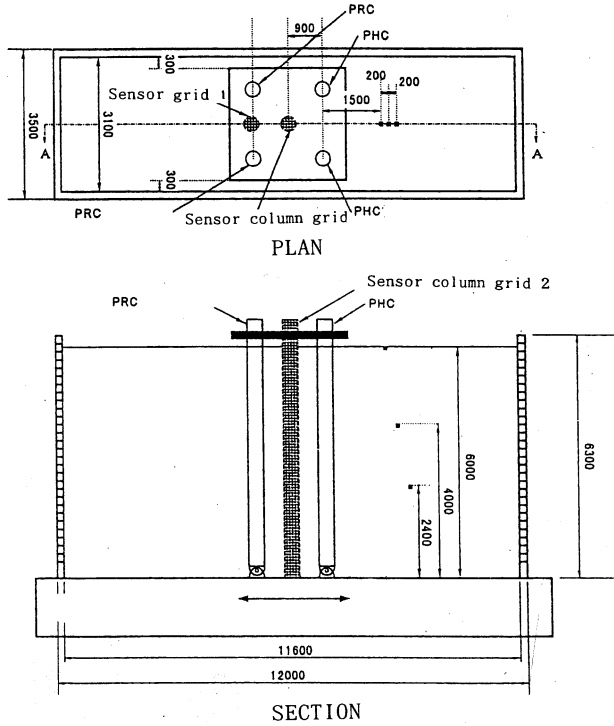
Outline of large-scale laminar shear box and test pile foundation system
